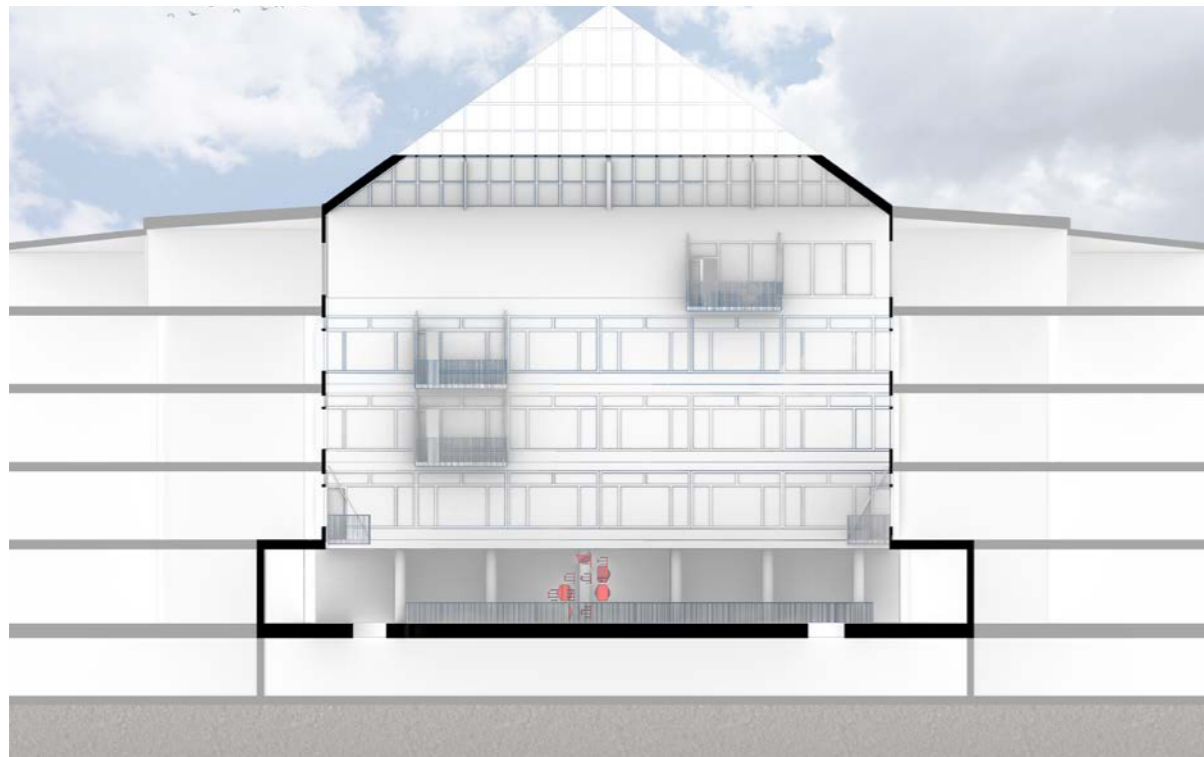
East elevation AA of Installation one and the atrium 1:350 0 4 8 12 16 20m
